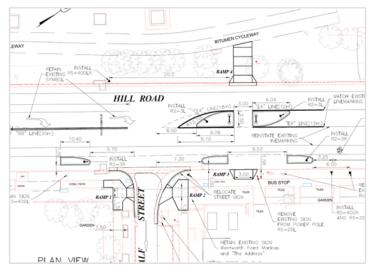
The final design plan of the approved pedestrian refuge island in Hill Road north of Half Street, Wentworth Point
